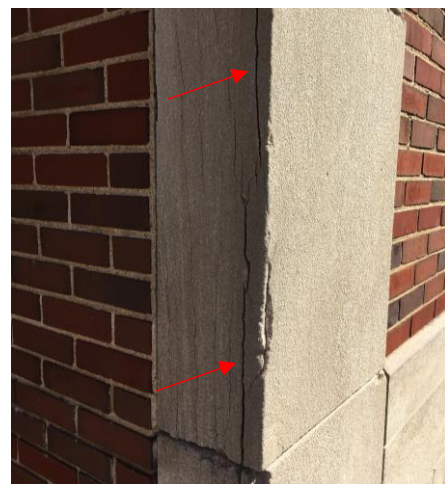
East Side of the Entrance showing the cracks in the limestone blocks on the stone pier. The red arrow indicates that the larger cracks will be injected.
